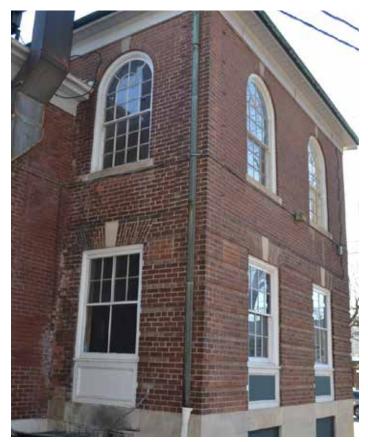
Typical window conditions of the 1940s addition, EVOQ
